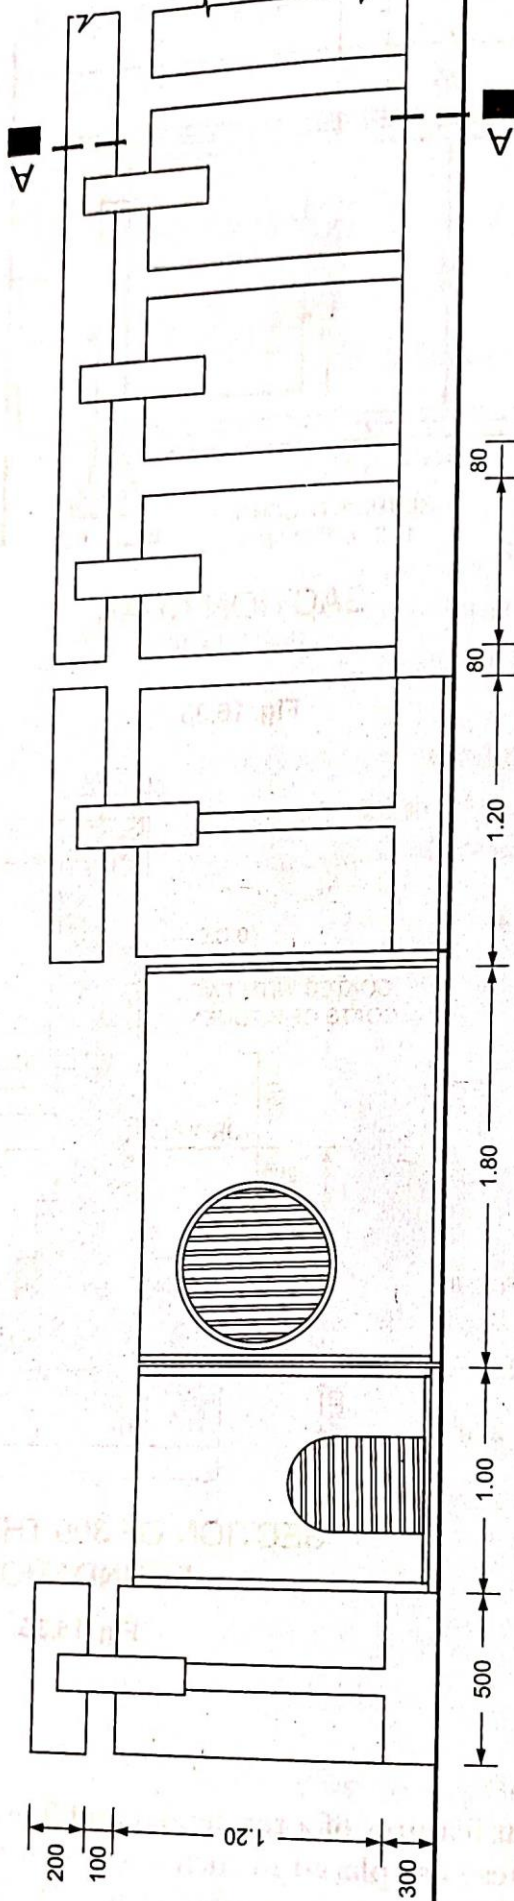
DESIGN OF COMPOUND WALL AND GATE
